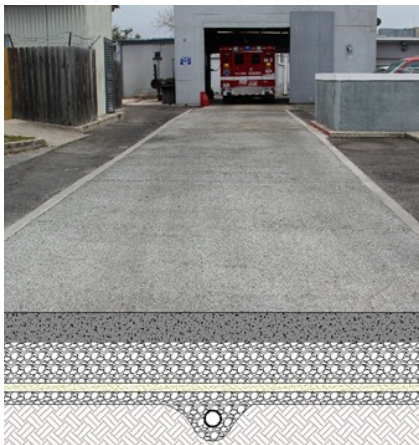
(left): Permeable pavement showing example cross section with trenched underdrain at Alamo Heights Fire Station, Alamo Heights, Texas. Source: Tetra Tech
